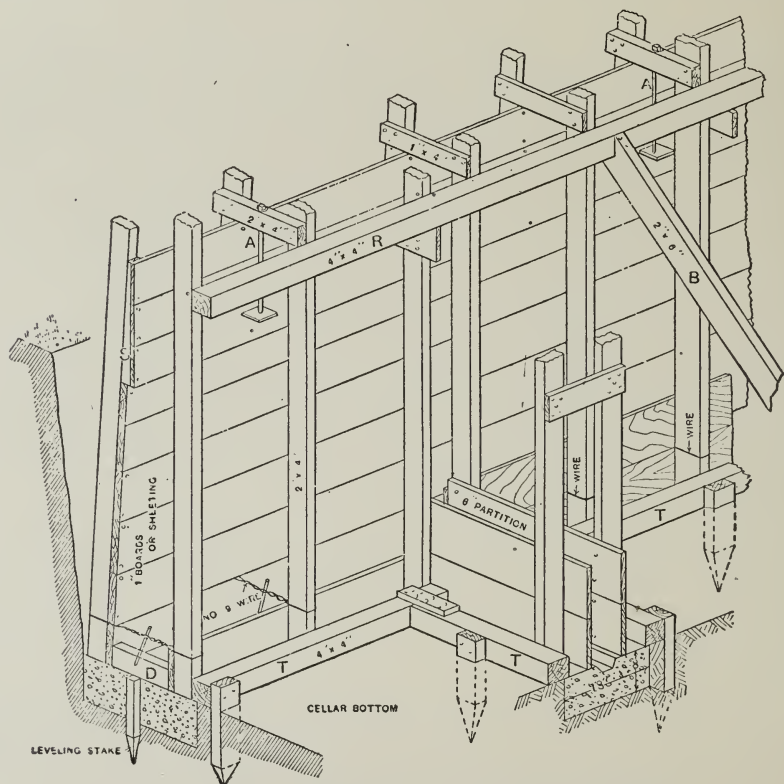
Forms for Concrete Wall Shown in Fig. 480.
